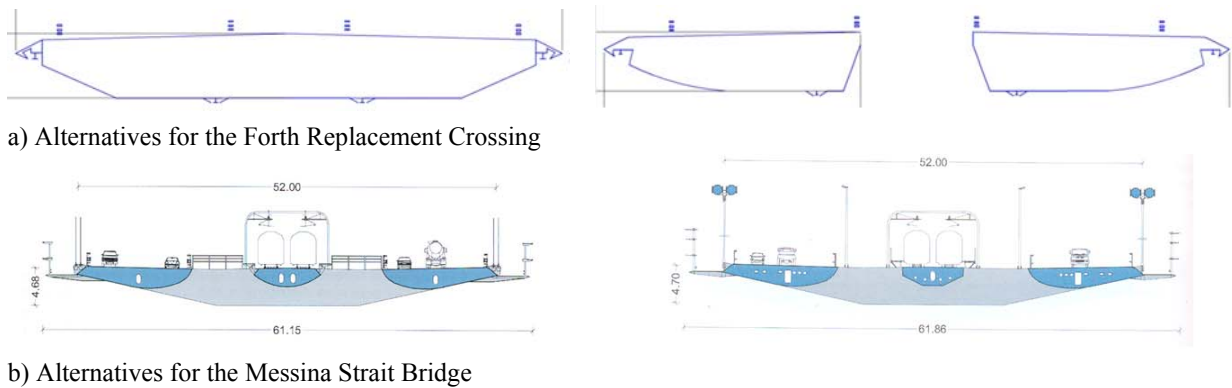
Deck design of the Forth Replacement Crossing and Messina Strait bridge
